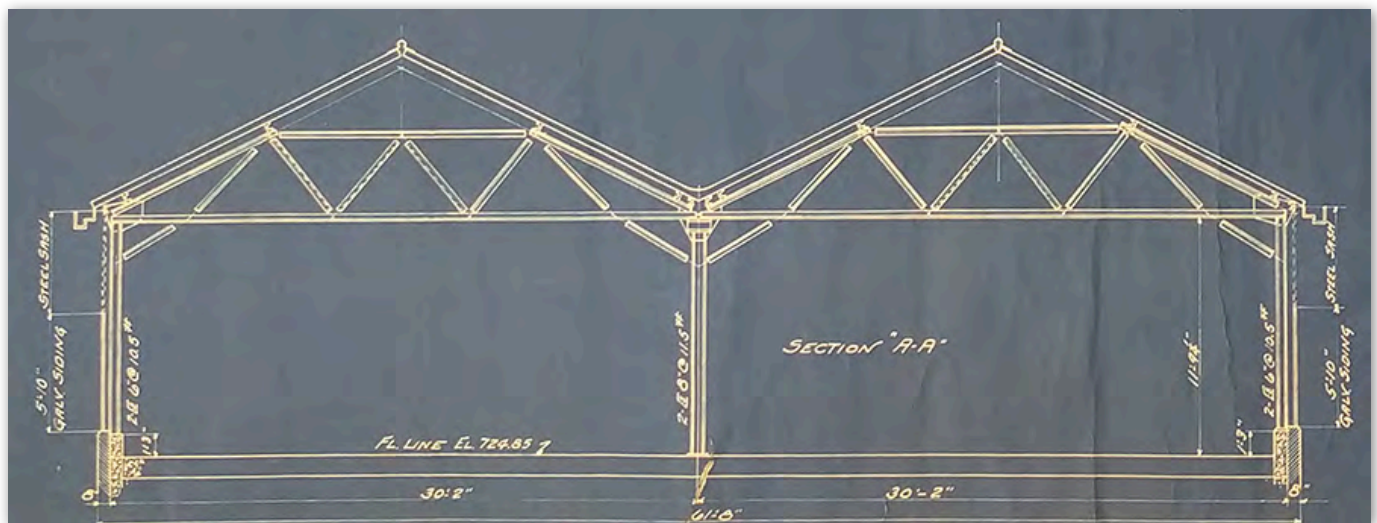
Section drawing through the Services Building, 1937, showing the double gable roof and steel trusses; excerpted from a set of blueprints for conversion of the building's function from dining hall to tailor shop. The notes on the left and right side indicate that the building was clad at that time in galvanized siding with steel sash windows above (SCI-Pittsburgh Facilities Archive).
